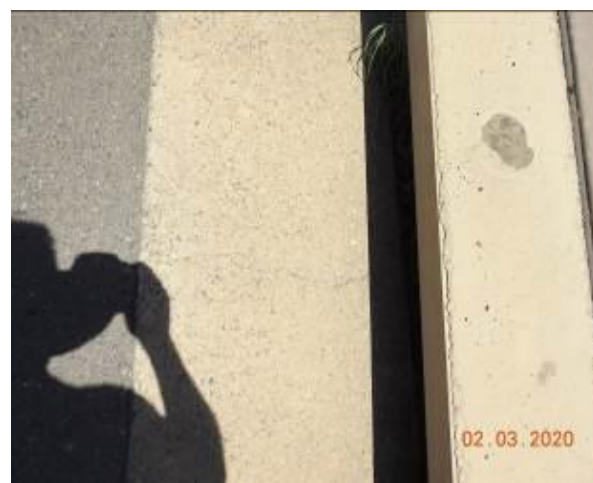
Crack propagation through stormwater inlet pit
